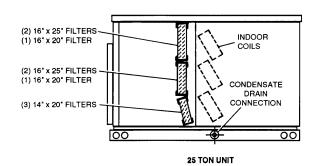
END VIEW LESS FILTER ACCESS PANEL
